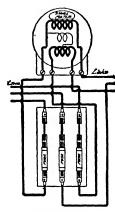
Wiring Diagram for 3-Wire Switch and Meter Courtesy of Trumbull-Vanderpool Electric Manufacturing Company
